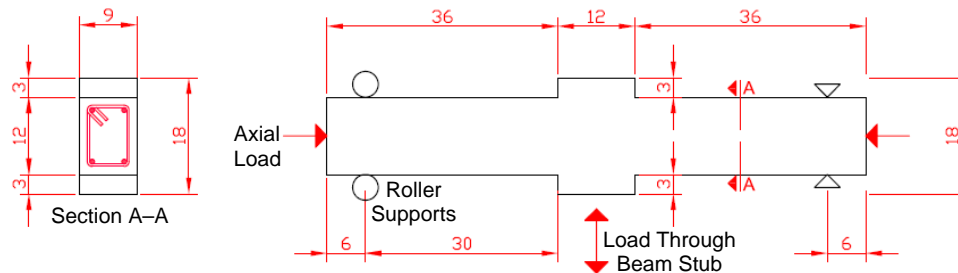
Geometry of a Typical Column Specimen (dimensions in inch).
